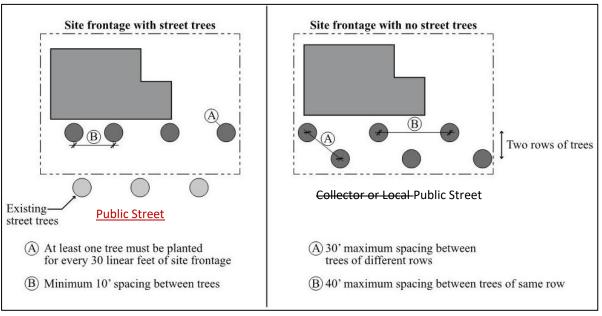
Required Tree Planting – Enhanced Landscaping Option
